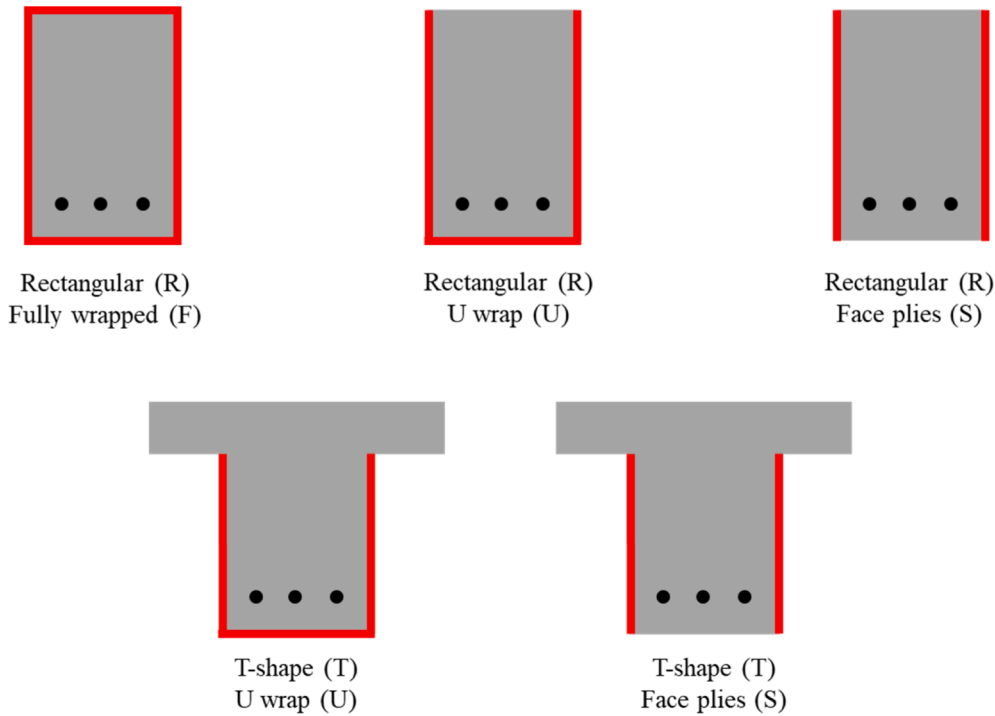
Schematic drawings of the cross-section of RC beams and FRP wrapping shapes
